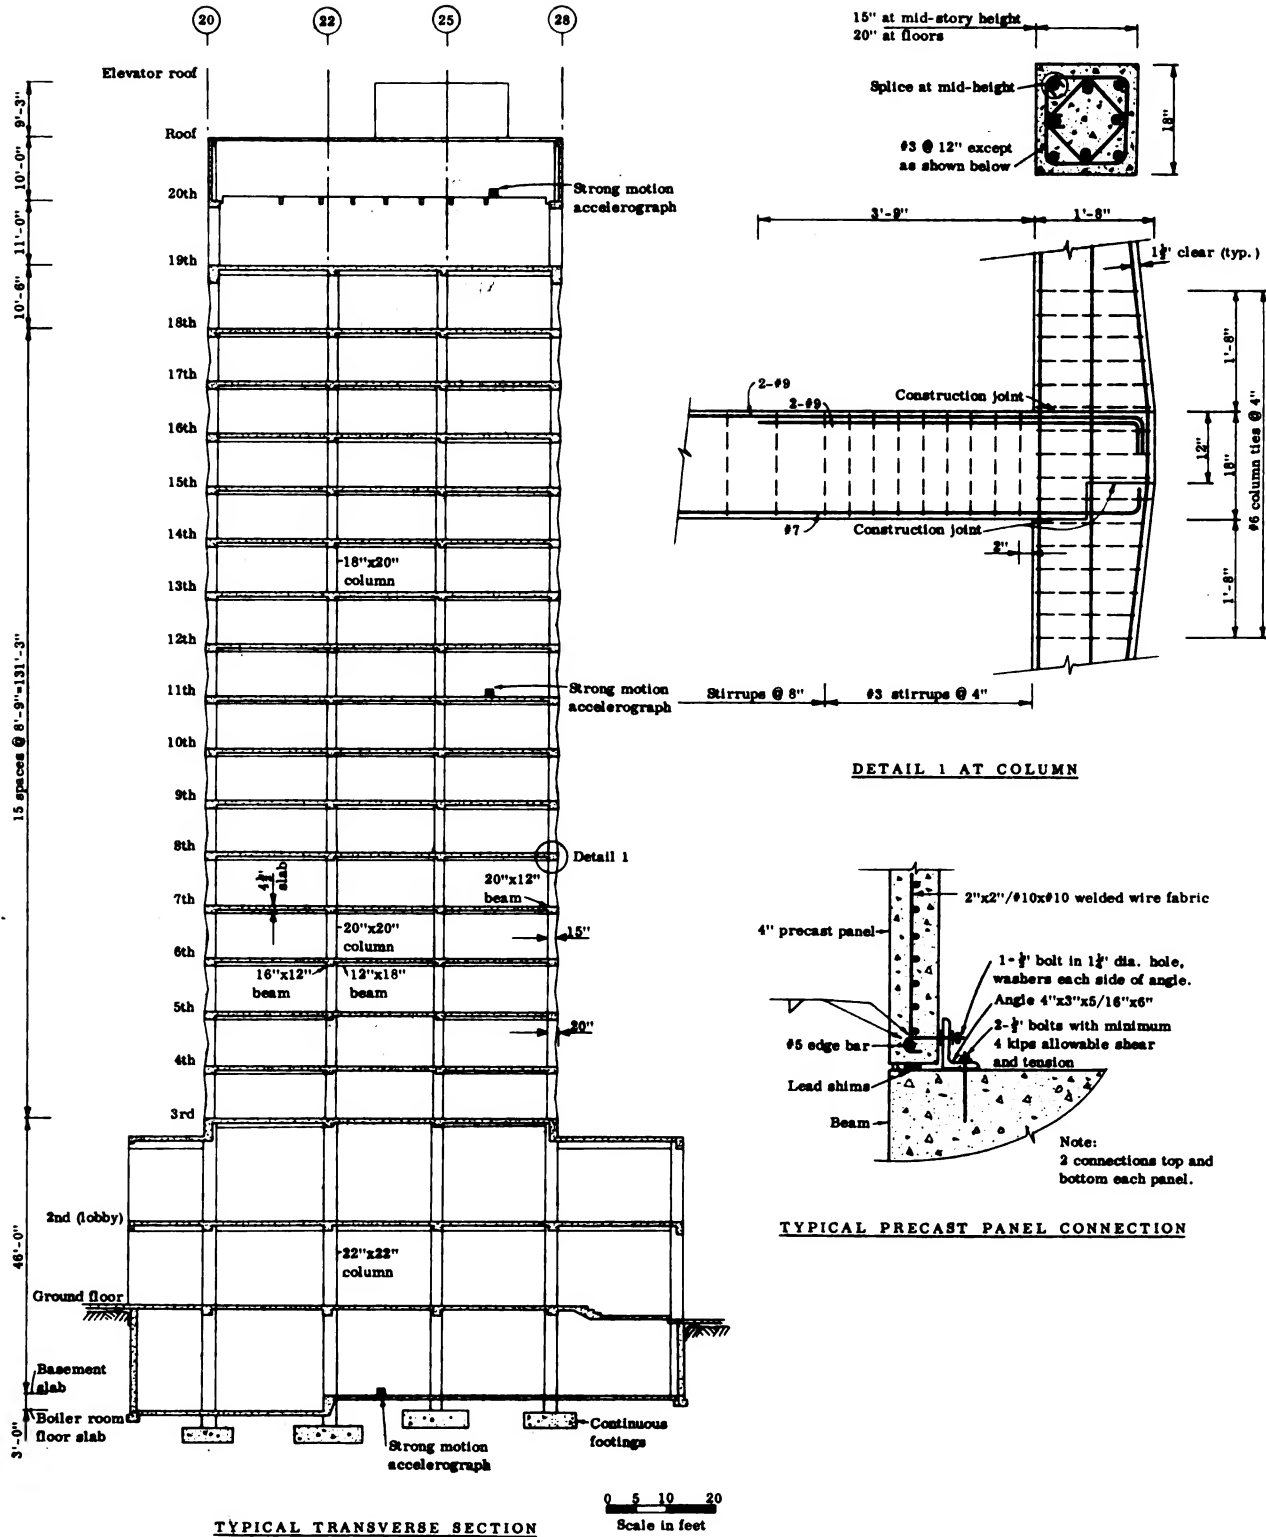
Sheraton-Universal Hotel. Typical transverse section and structural details.
